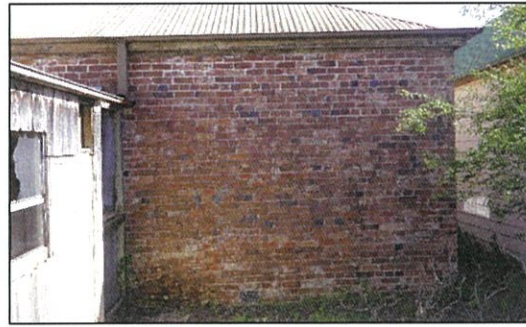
Rear elevation. Note evidence of efflorescence, spalling and loss of mortar joints.
